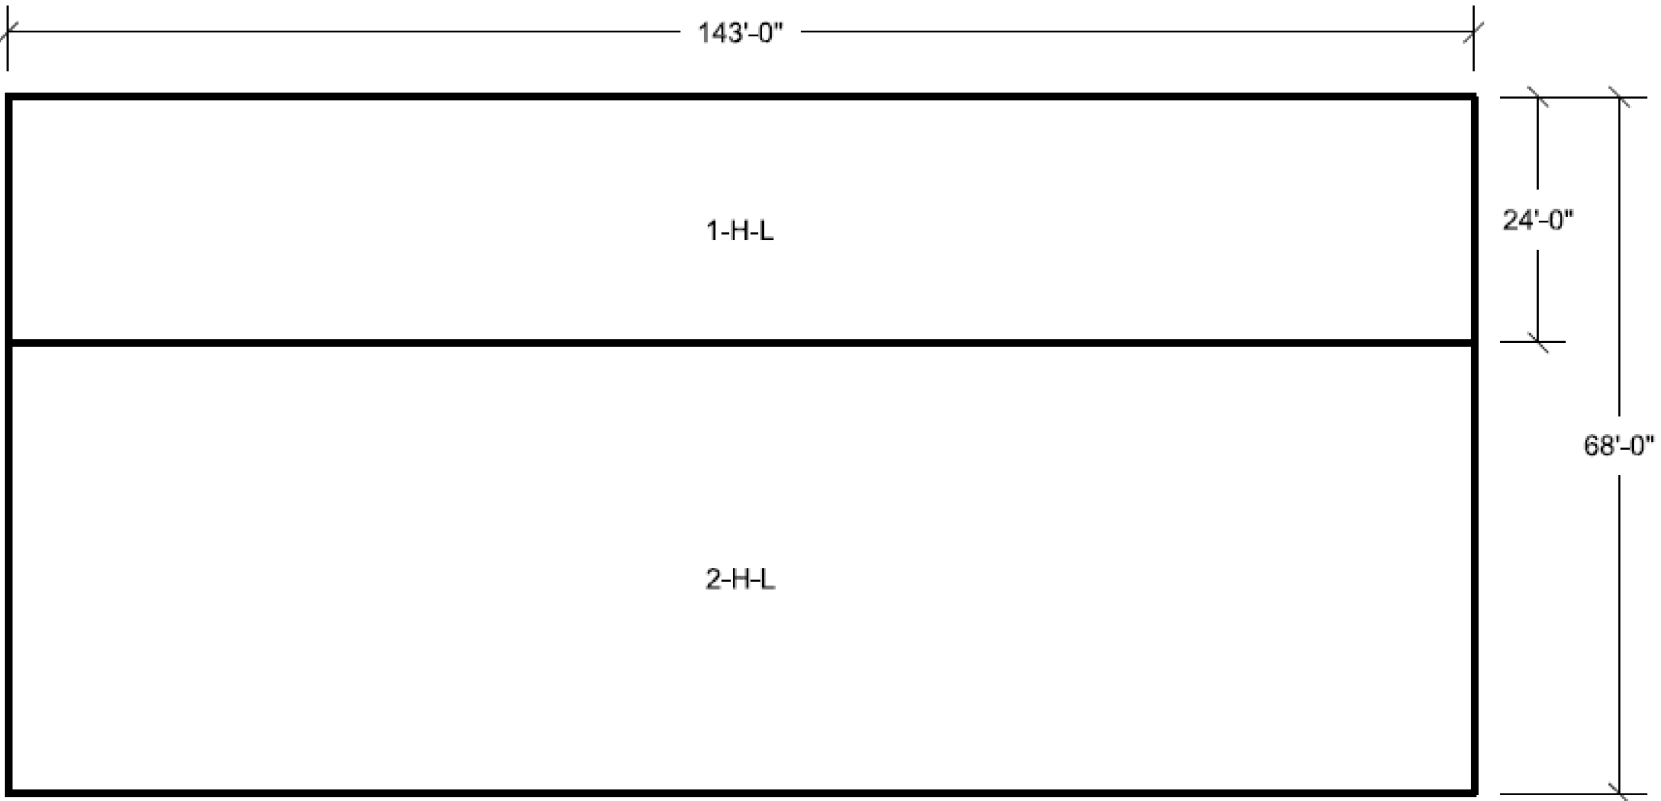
H.6-53 Pump House North Wall Looking South Horizontal Reinforcement Zones Far Side Face
